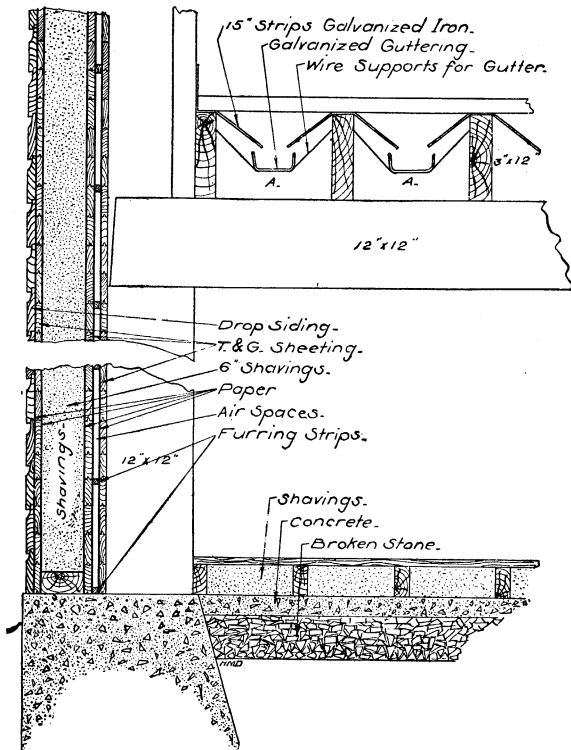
Diagrams showing the wall construction and slat floor used in the building shown in figure 6.
